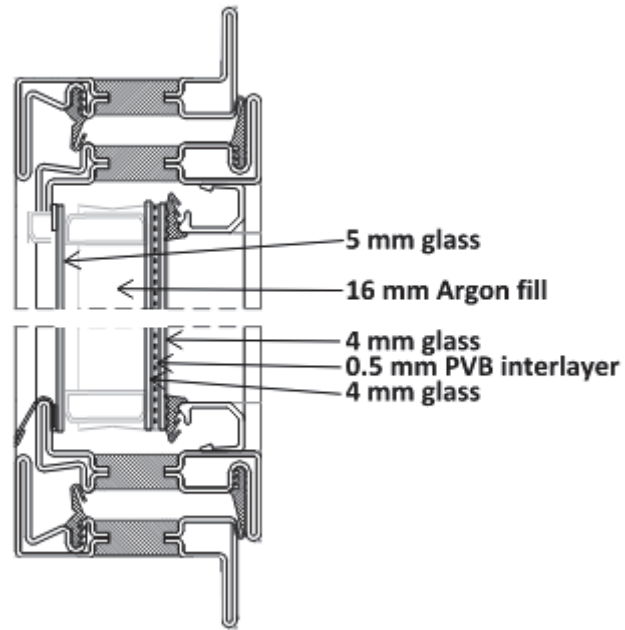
Event space exterior wall detail and sound transmission loss
